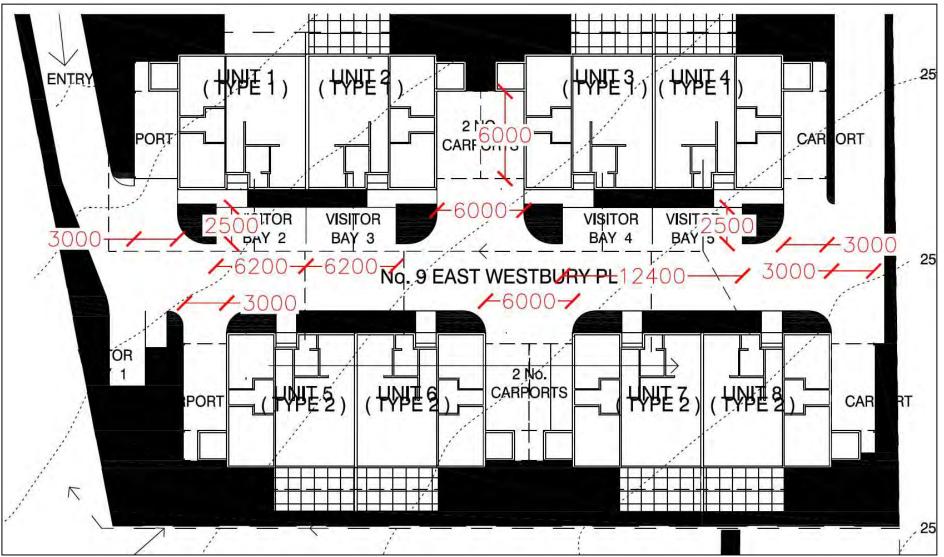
DIMENSIONED SITE LAYOUT PLAN
